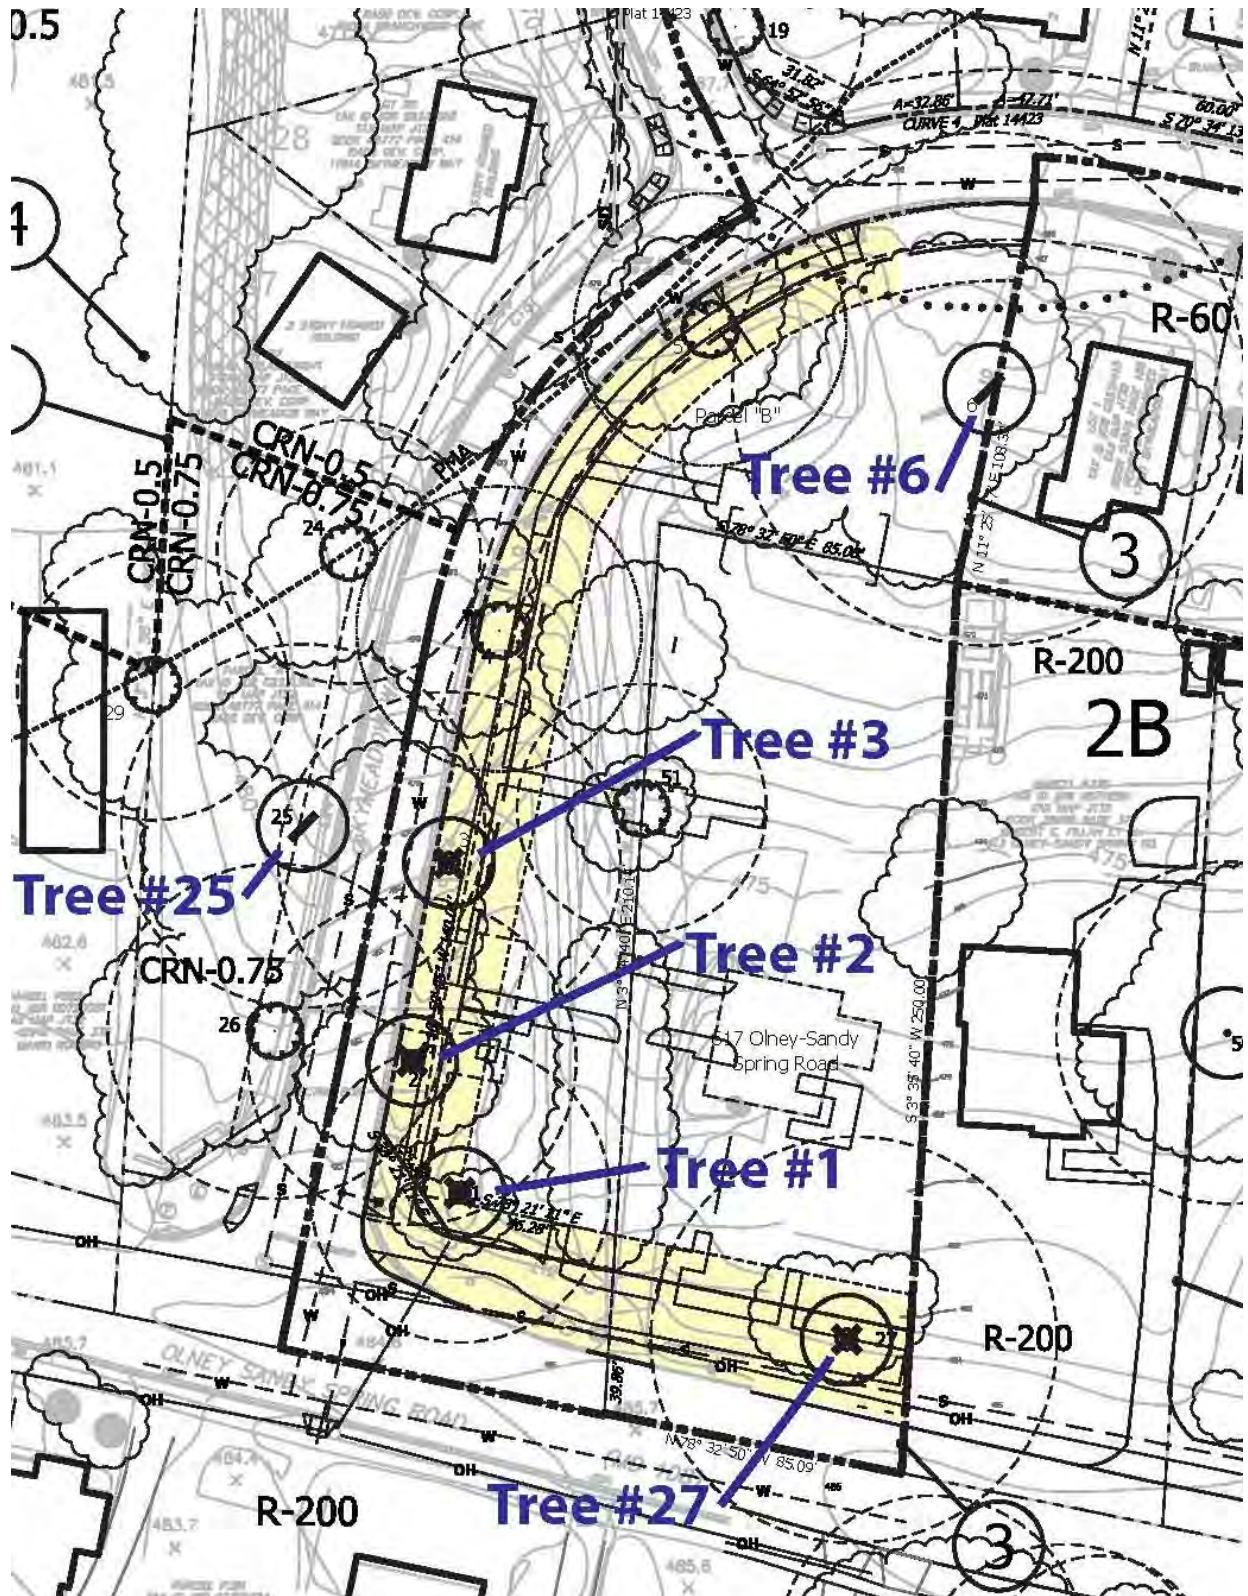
Detail of SNRI with proposed public improvements shown in yellow and impacted specimen trees highlighted.
